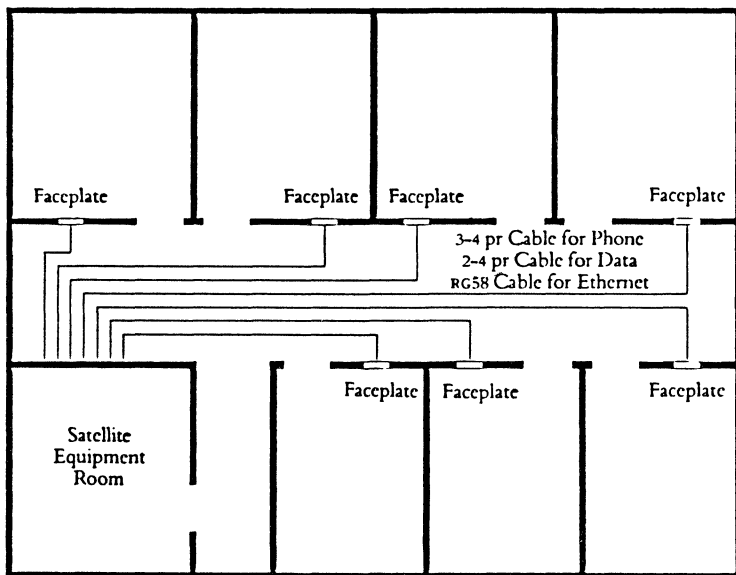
■ Typical DECconnect Site Cabling Configuration
